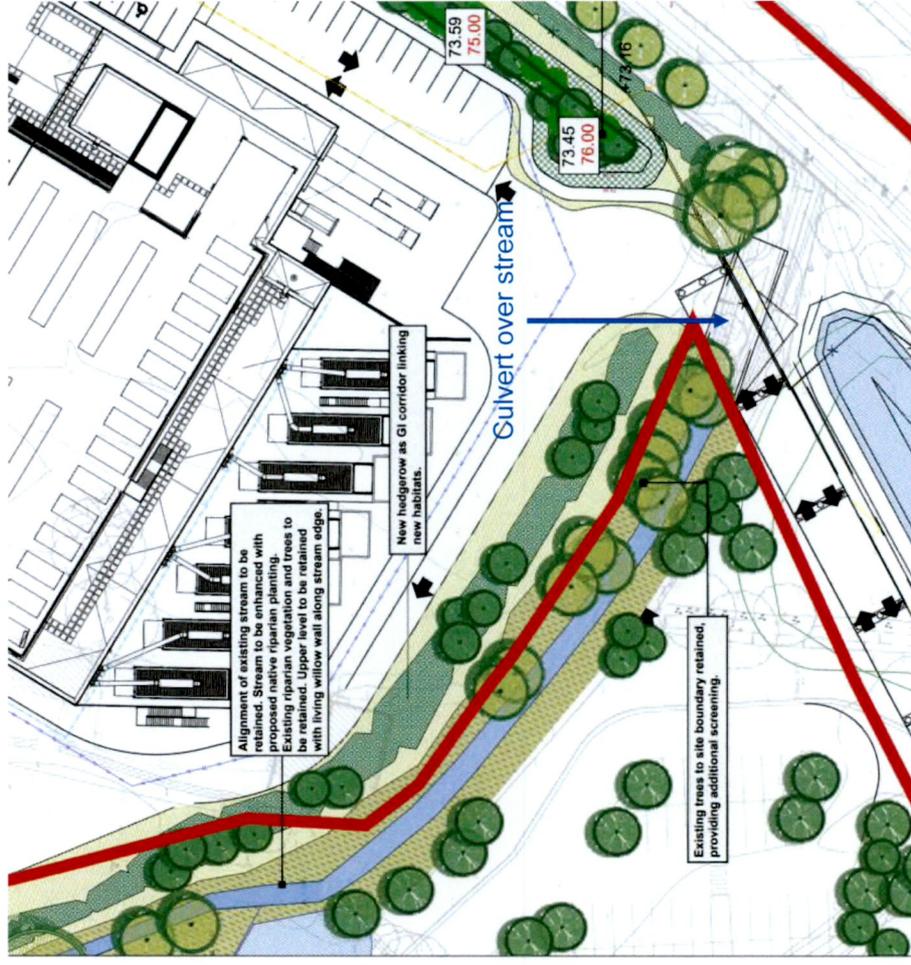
Extract from Site Layout showing the proposed Protection of the Baldonnel Stream
